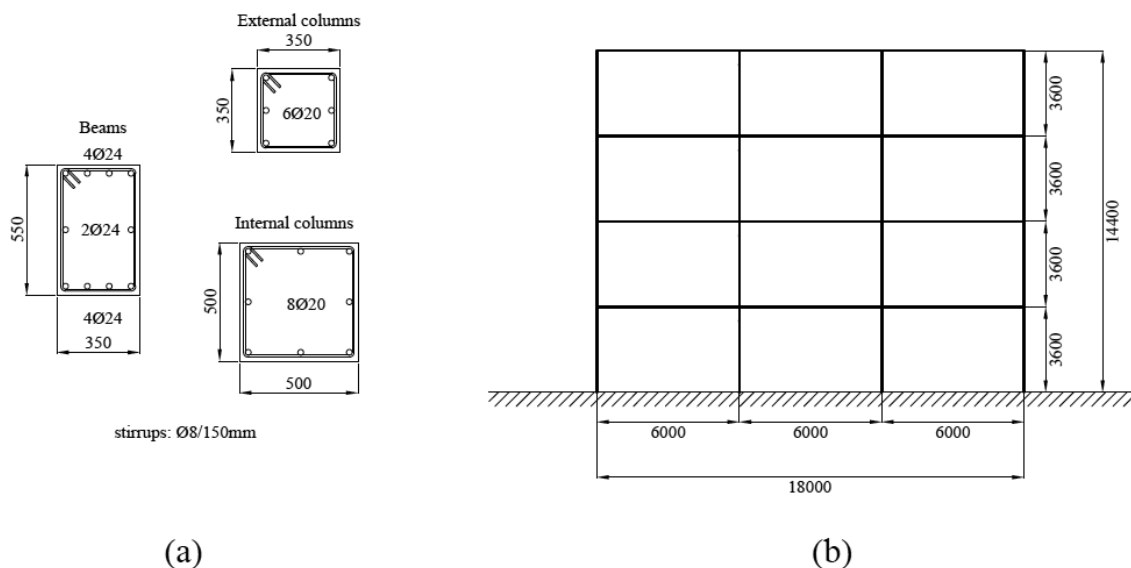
a) Cross-section properties for the concrete structural elements, and b) front view of the structure. Nominal dimensions in millimetres.
